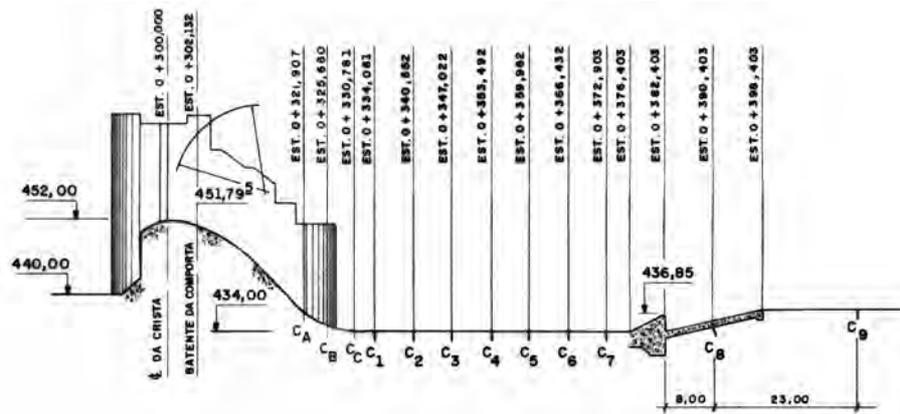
Pressure measurement points. Longitudinal section of the central bay.
